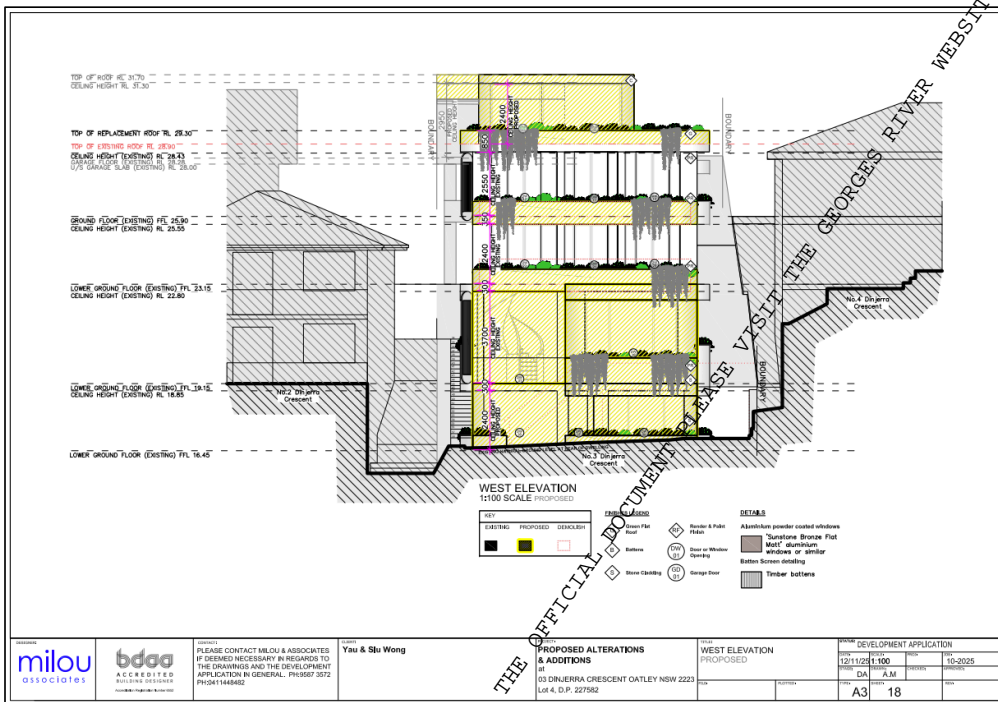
Proposed western elevation (Milou & Associates, 2025)
